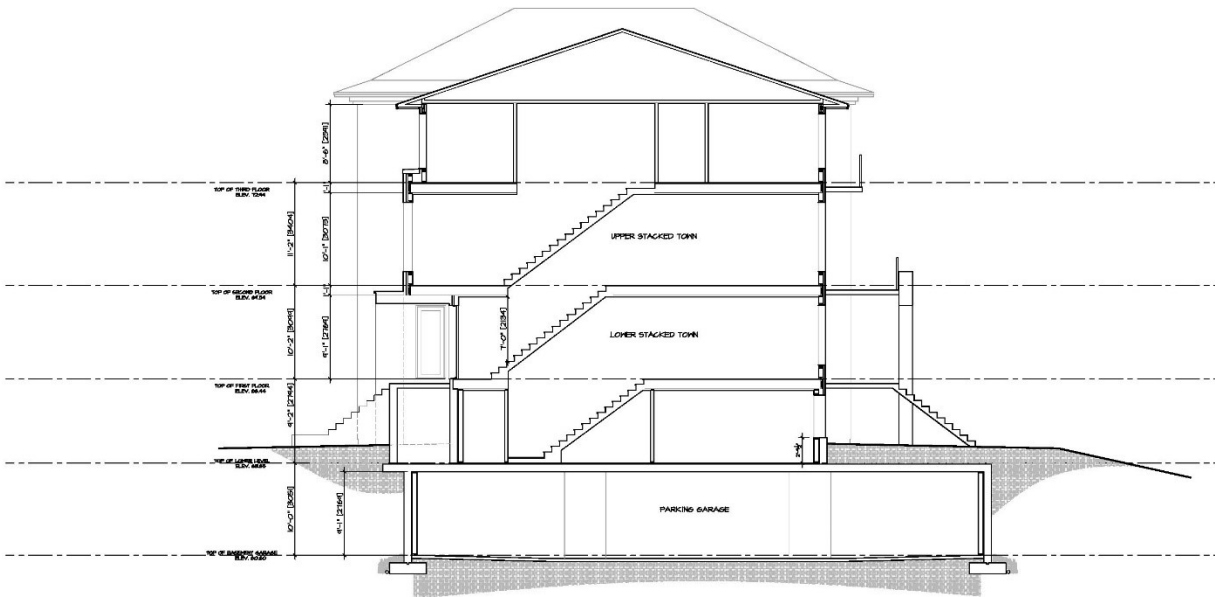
Cross section through the building illustrating the stacking of the townhouses. Source: Hobin Architecture April 2018.
